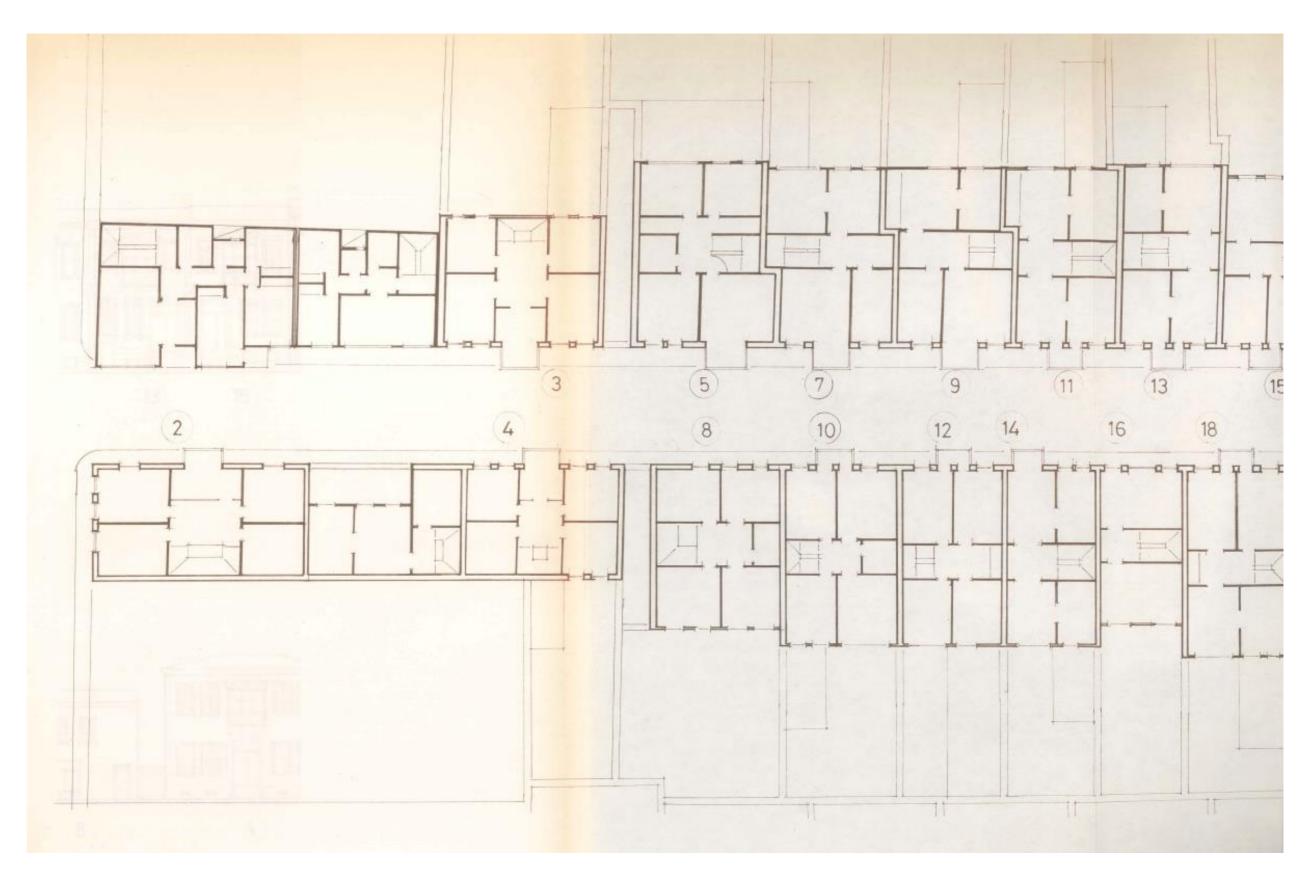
First Floor Plans of İzmir Houses on 1482 street (Source:Moral 1990)
